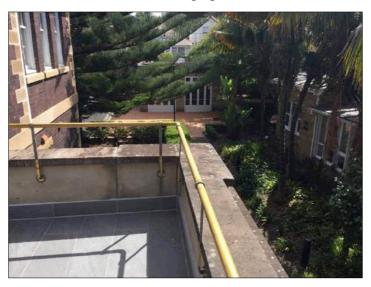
Showing the pipe railing and modern tiling on the northern porch at first floor level.
